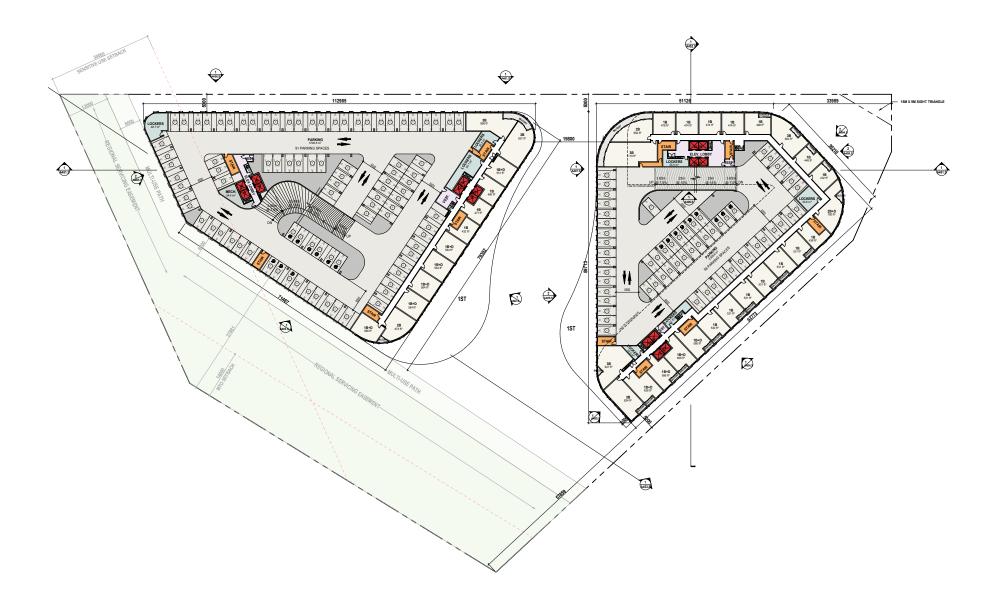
Level 3-4 Floor Plan (BDP. QUADRANGLE ARCHITECTS LTD.)
